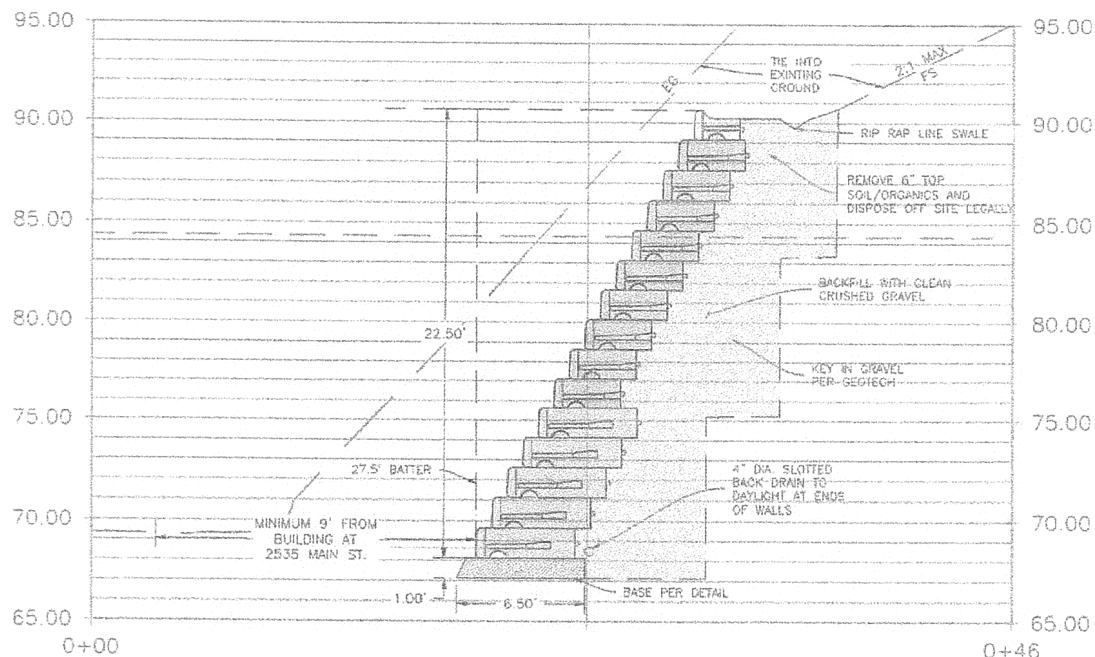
22.5' Redi-Rock wall with 9' offset and matching top of failure slope.
